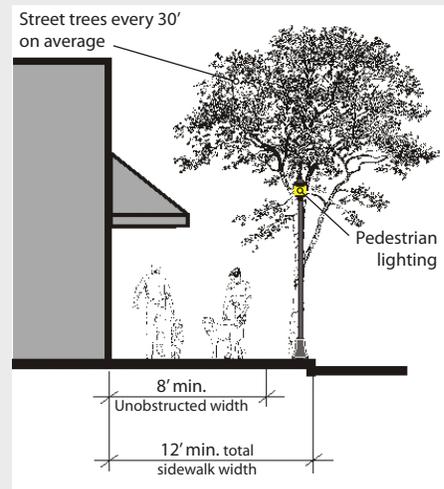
Minimum internal walkway requirements along the facade of mixed-use and retail buildings 100 feet or more in width
